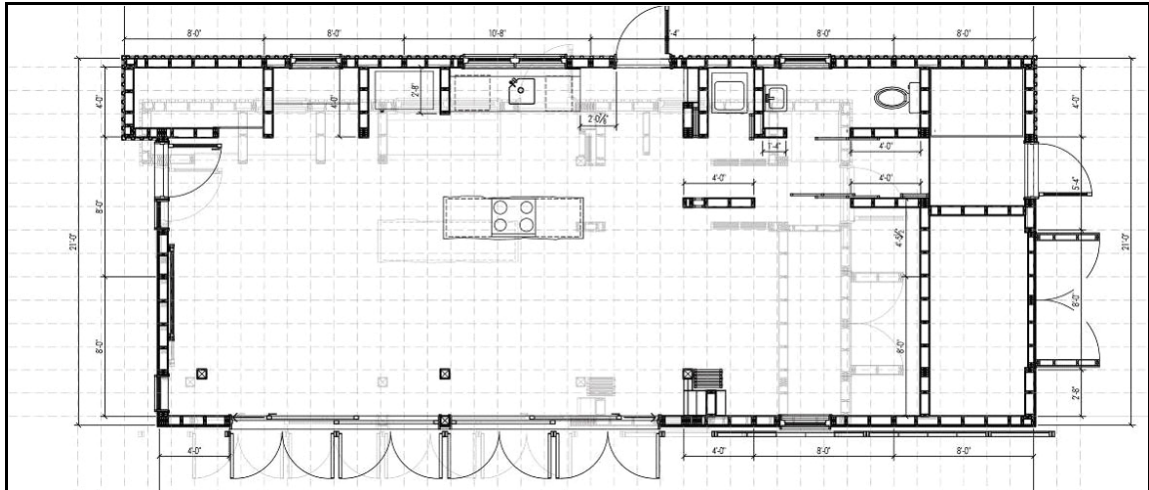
Existing LEAFHouse Plan overlaid with LEAFHouse Rationalized.
